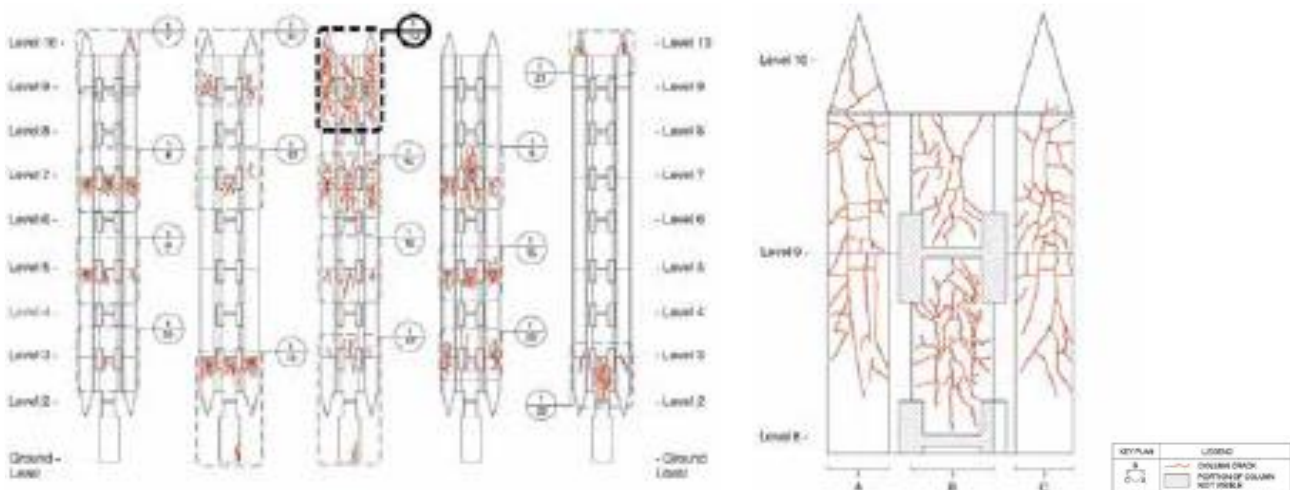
North elevation column stack concrete crack map: (a) unfolded view of all sides including exterior and interior faces; and (b) an enlarged view of Detail 1/14
